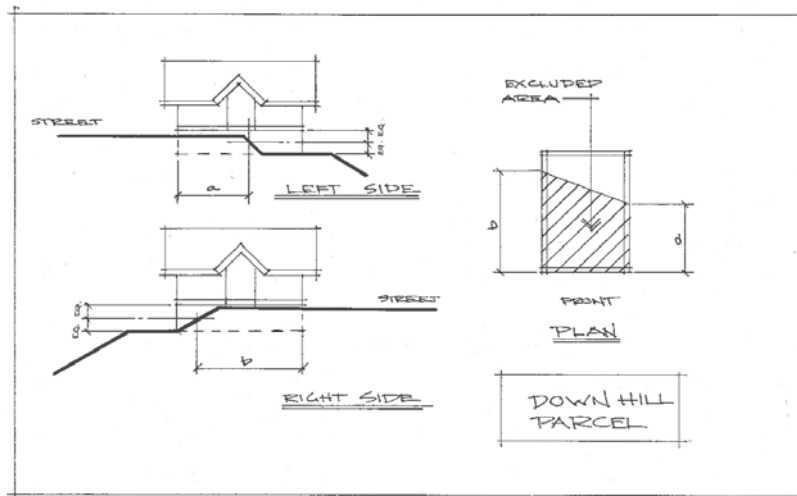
In-Ground Basement Floor Area for a downhill parcel
